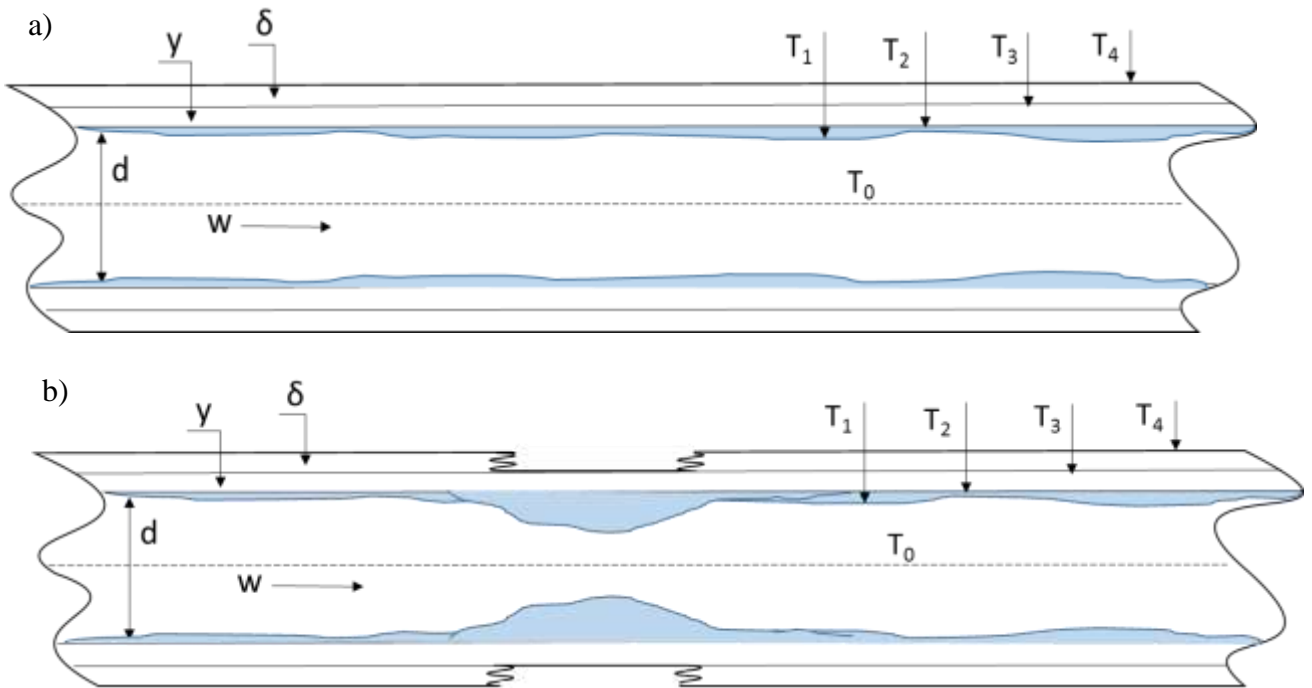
Section of the field pipeline, a) heat-insulated pipe b) damaged thermal insulation layer on the pipe
